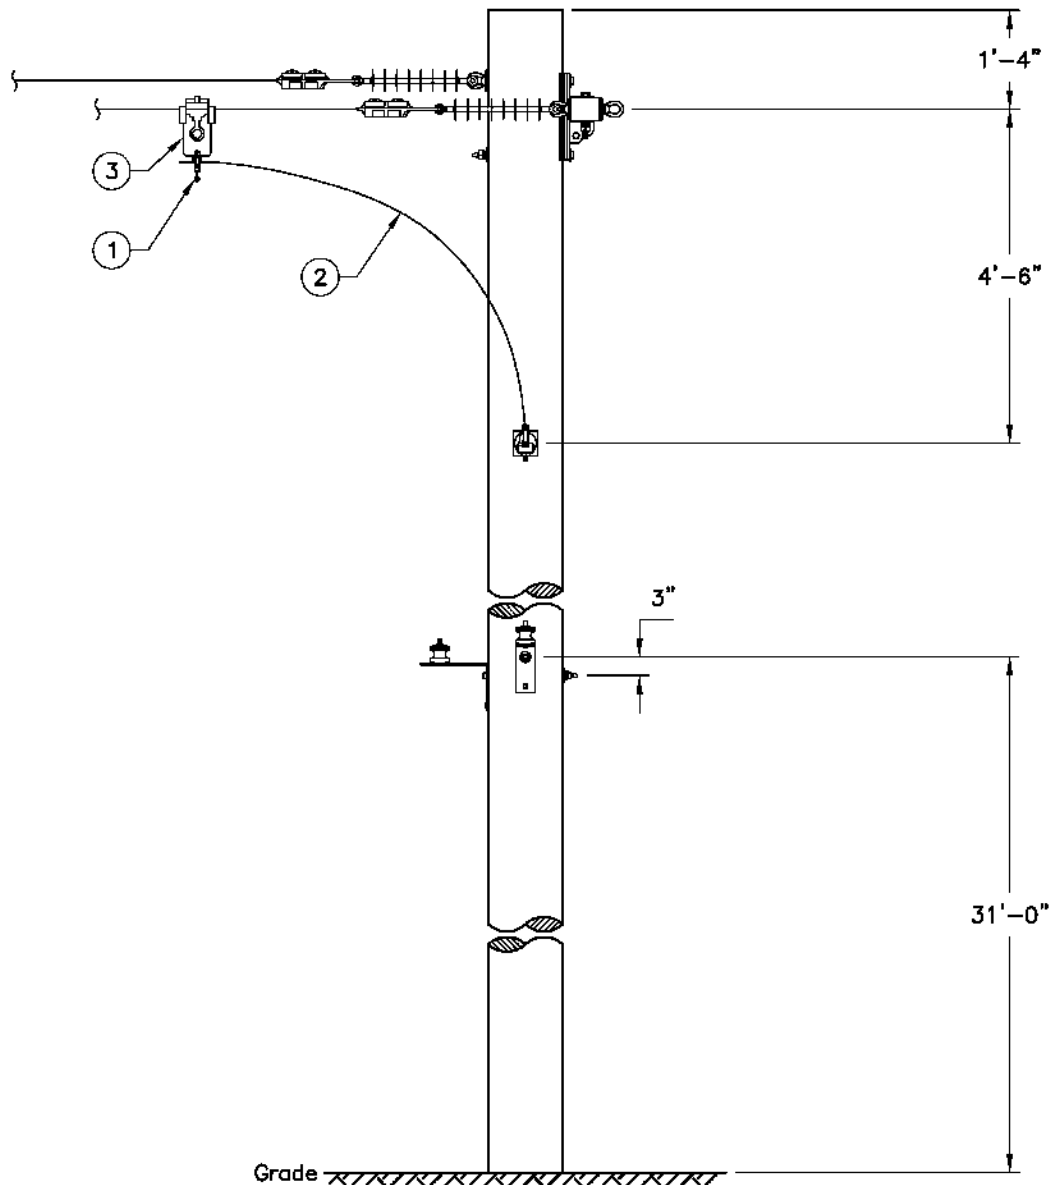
Single-Phase Double Deadend 0°–60° Crossarm Jumper, Side View
